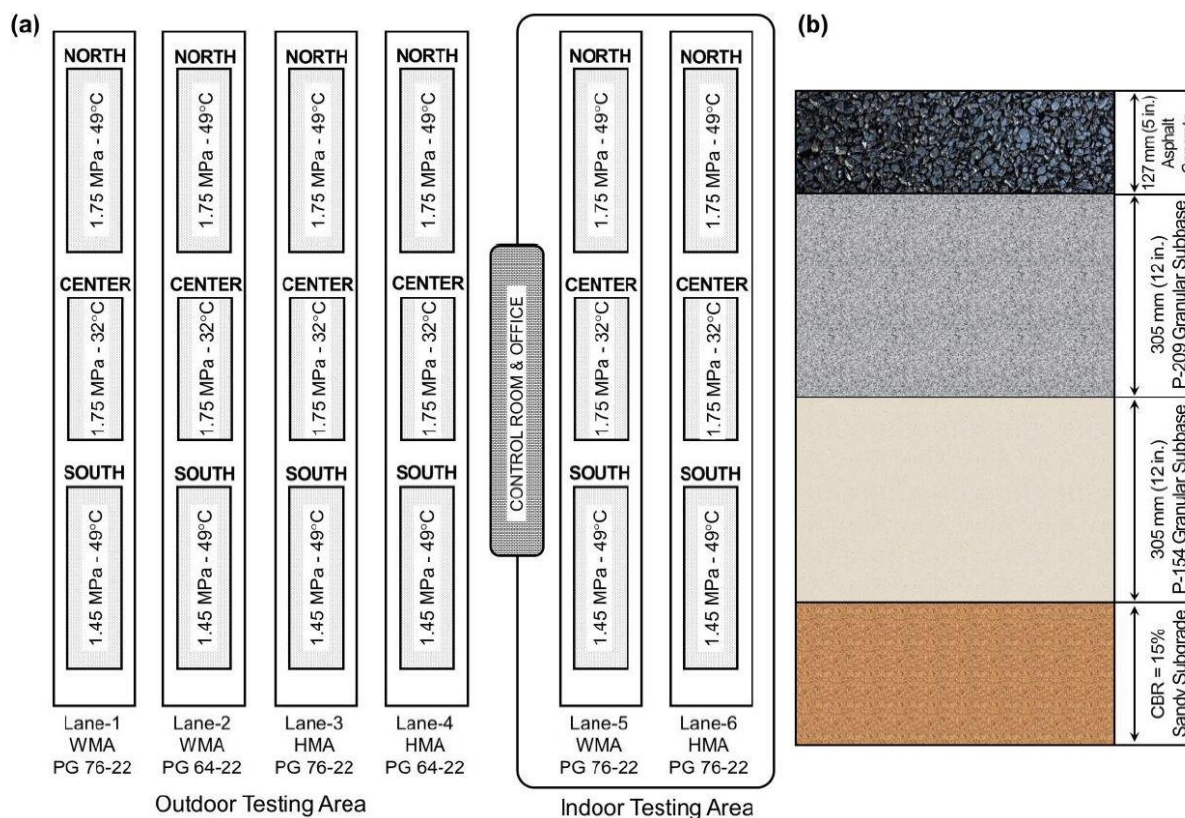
(a) Plan view of the full-scale test sections; (b) Cross-sectional view of the designed test sections (131).
